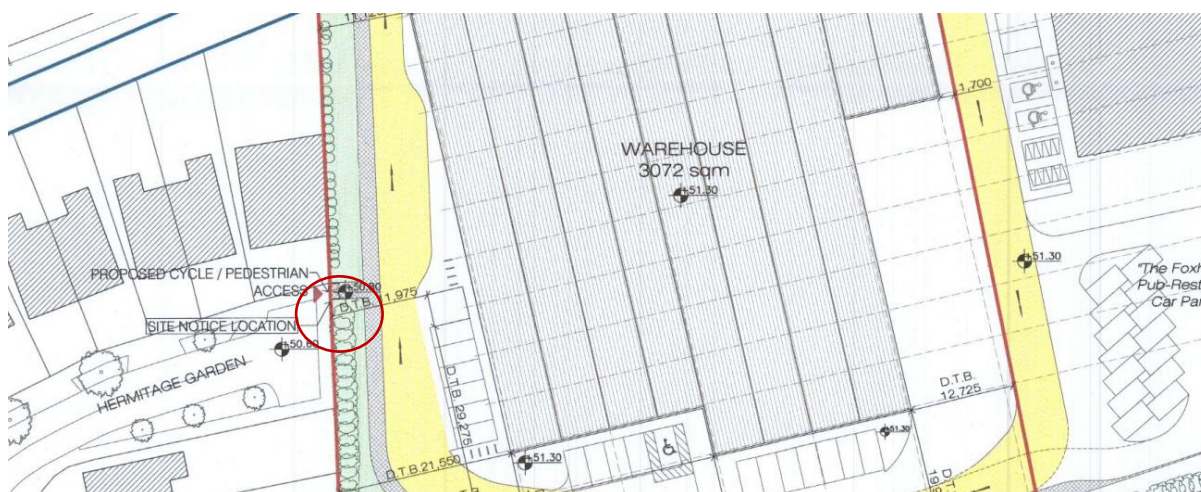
Extract of site plan showing the location of the proposed pedestrian access.
